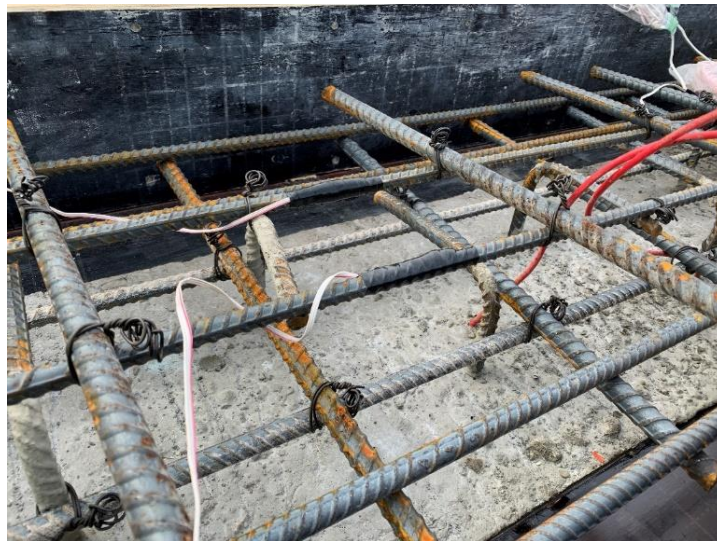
5-mm foil strain gages installed on NB precast specimens
